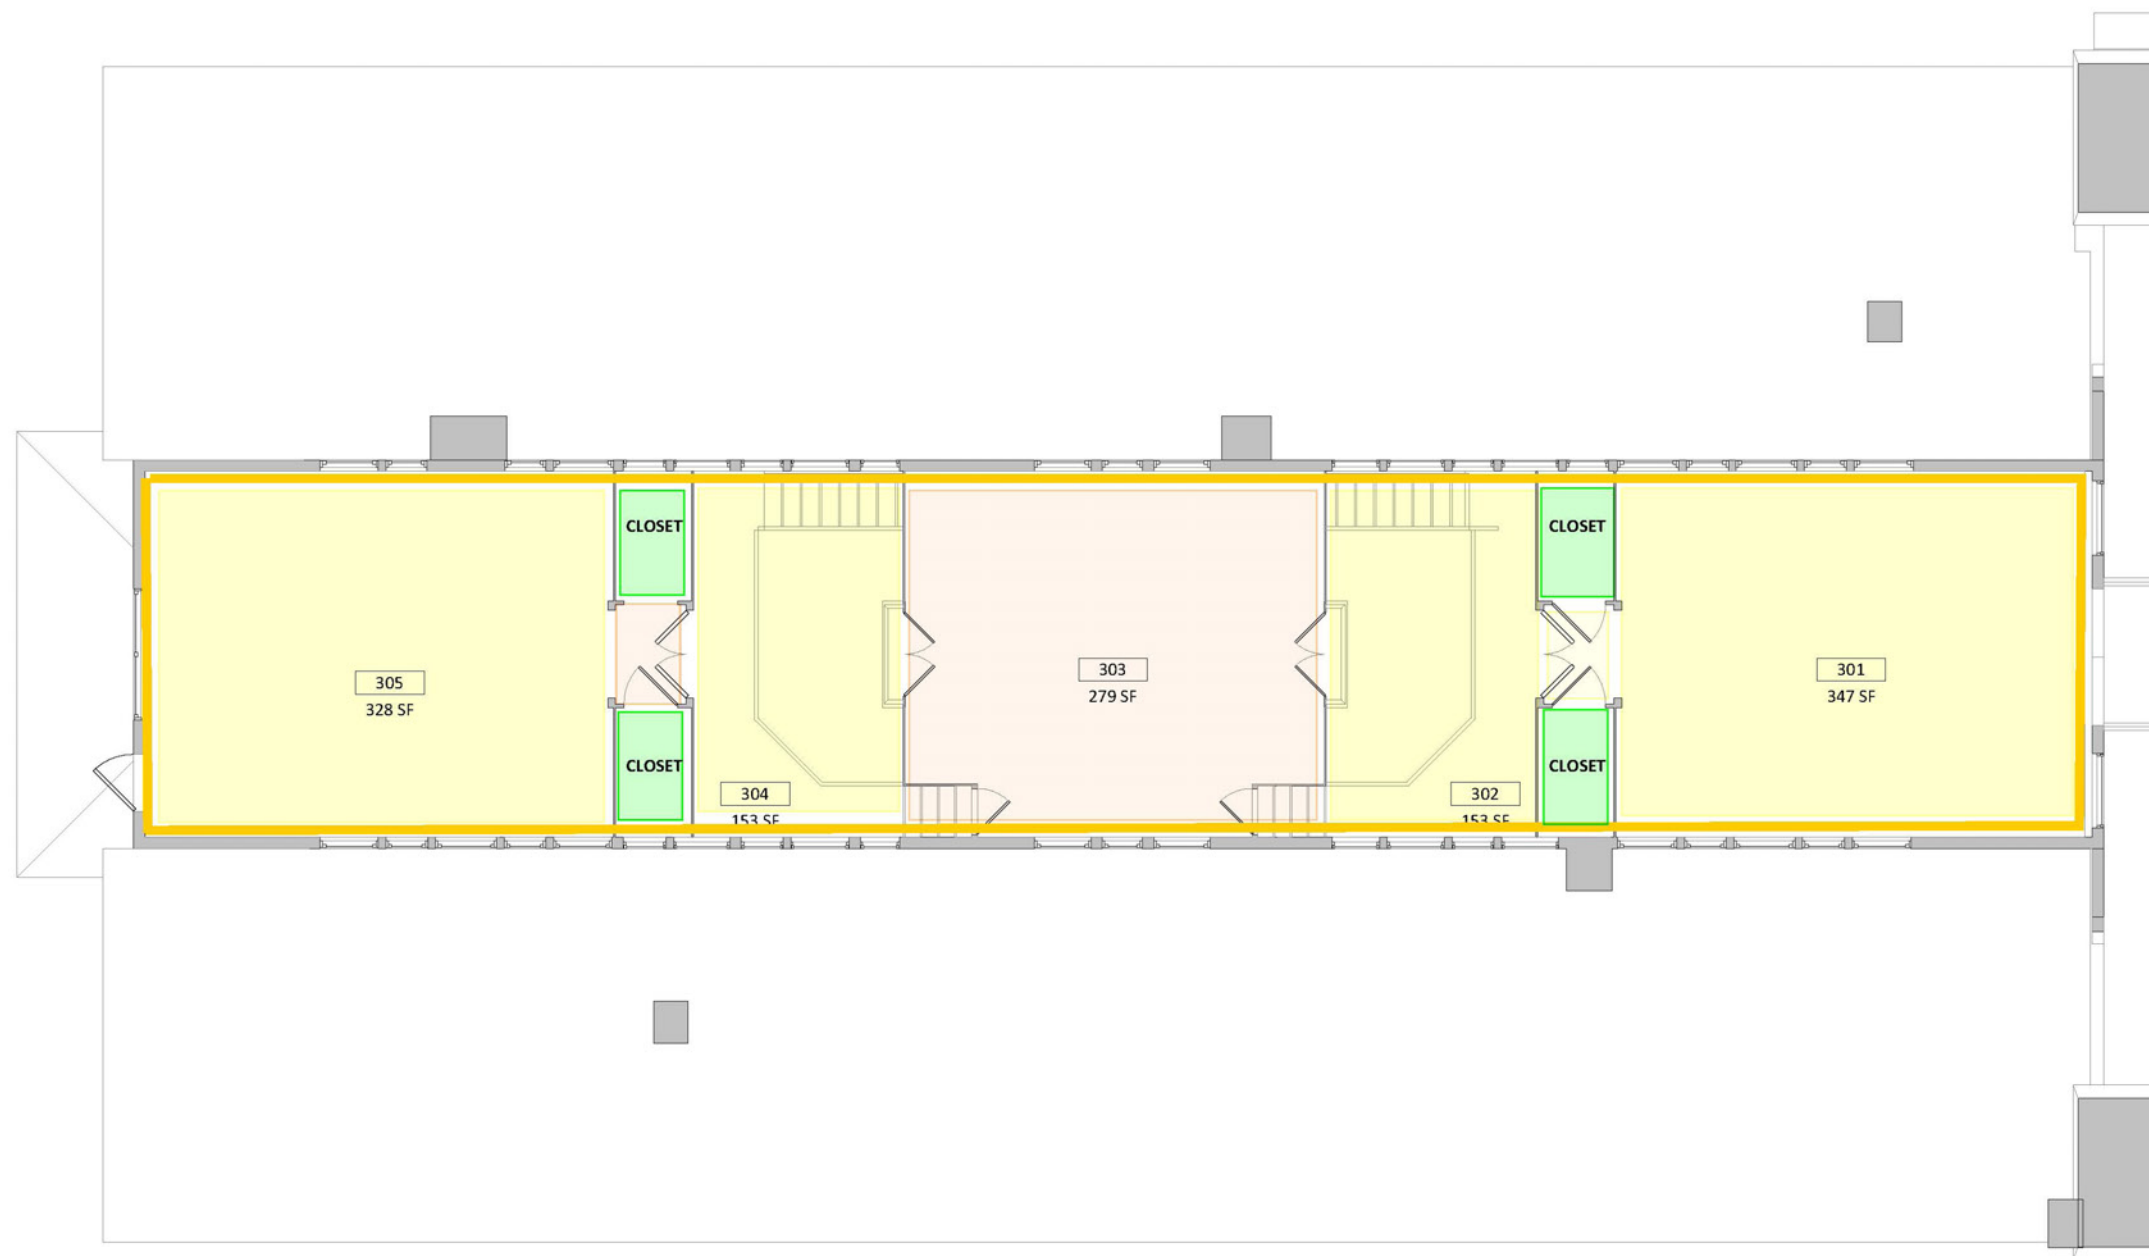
Existing Conditions – Second Floor Plan and Interior Wall and Ceiling Finishes
